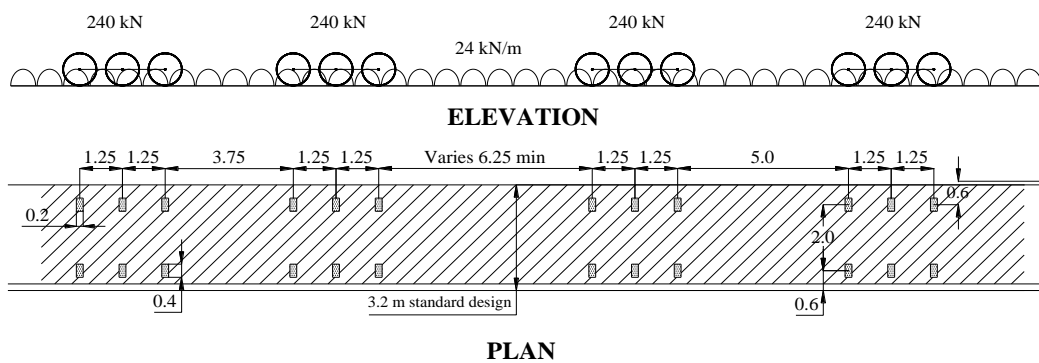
S1600 stationary traffic loading plan from AS 5100.2
